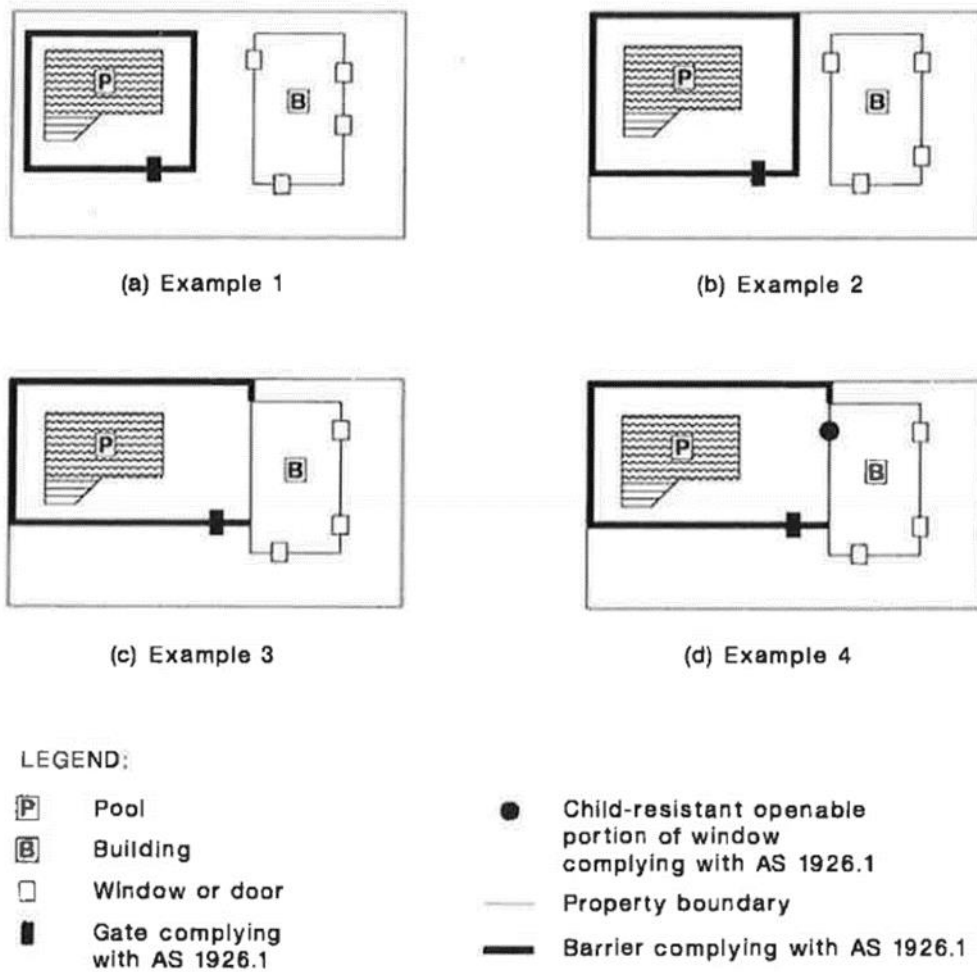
TYPICAL EXAMPLES OF OUTDOOR POOL BARRIER LOCATIONS
